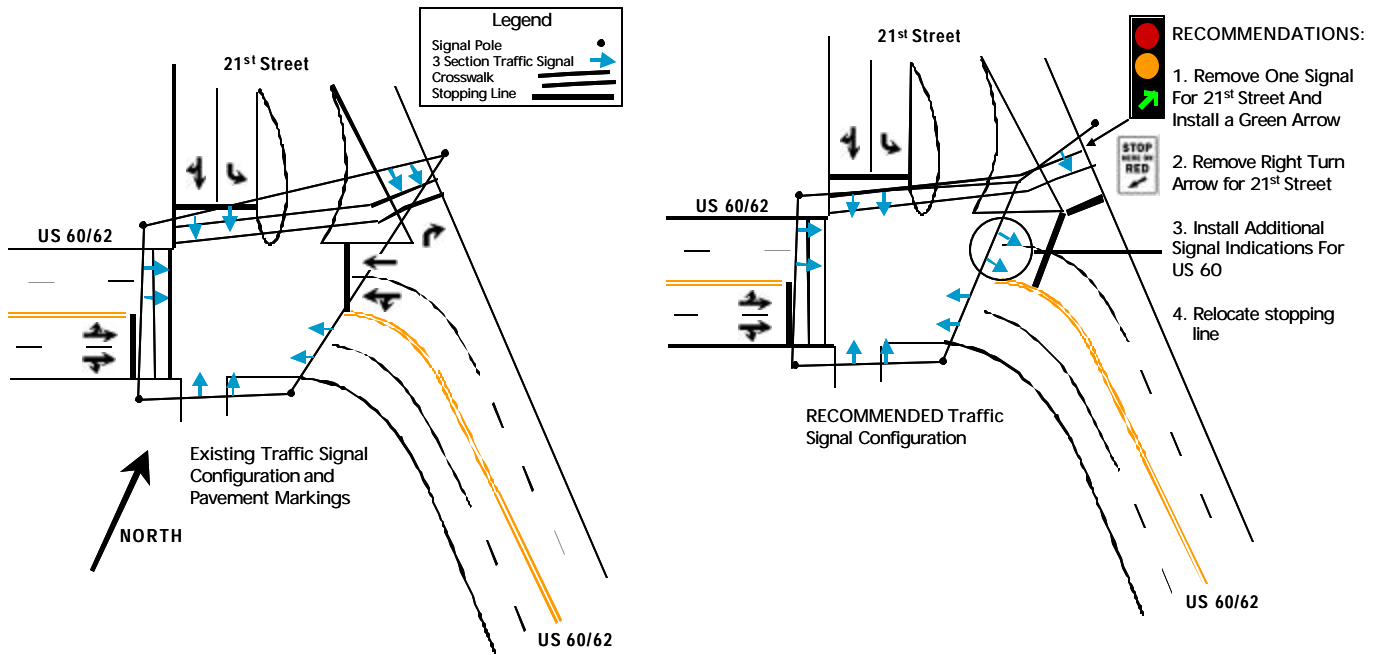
Existing And Recommended Configuration For The Traffic Signal on US 60 at 21st Street
